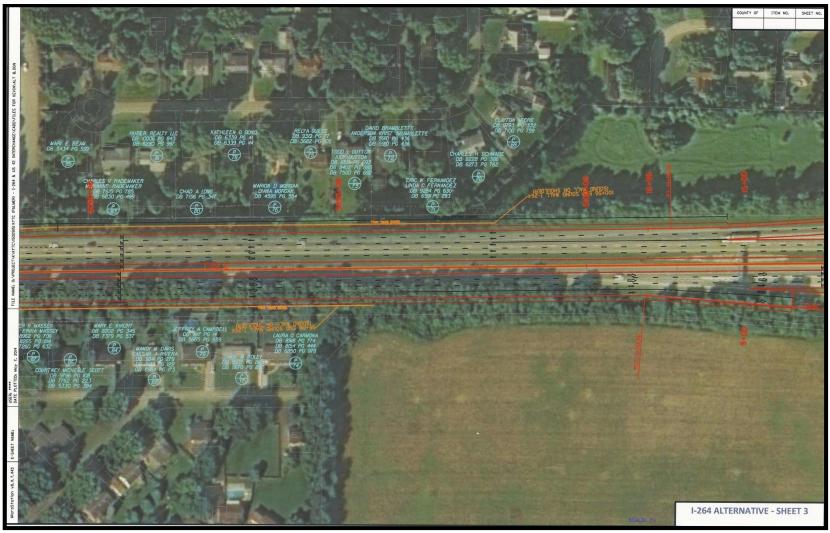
Alternative B: Preferred I-264 Widening Alternative – Sheet 3 (DRAFT)
